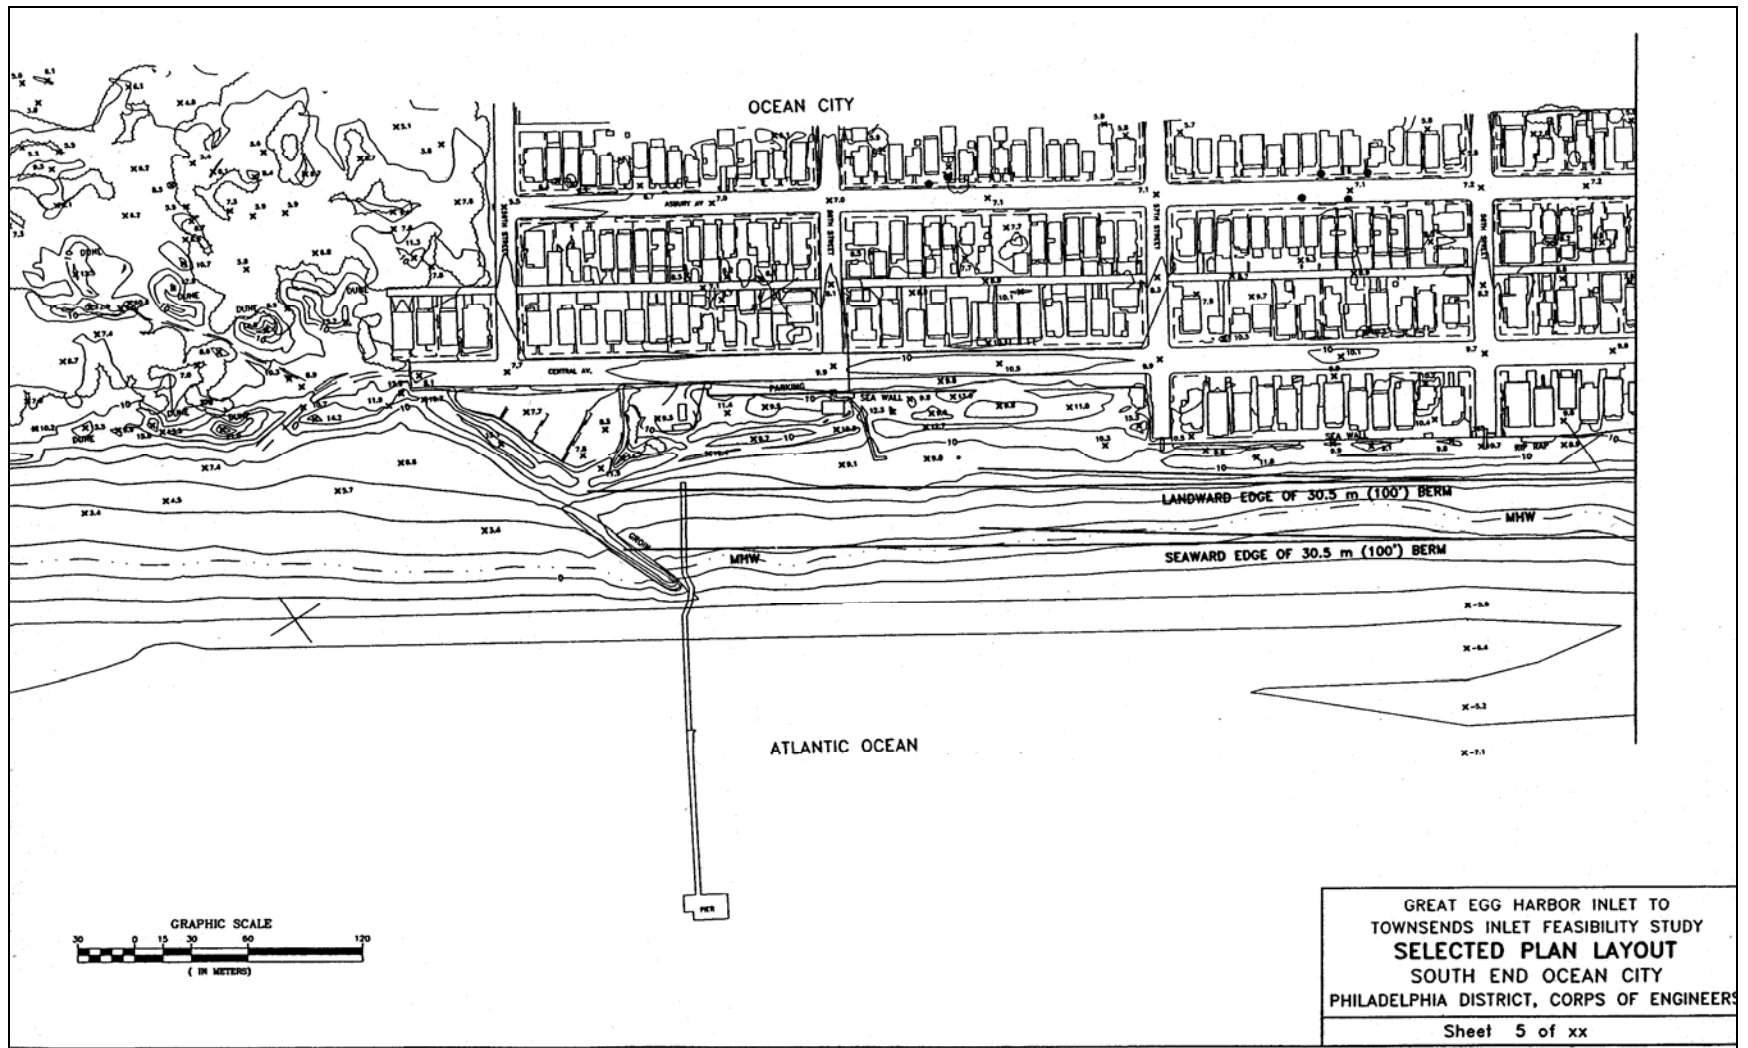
Selected Plan Layout for Ocean City, NJ – South of 55th Street to 59th Street
